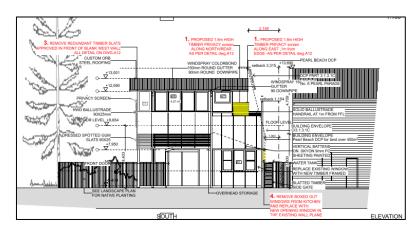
South Elevation (street frontage) proposed modifications Part B (changes to the proposal are identified in red text)
